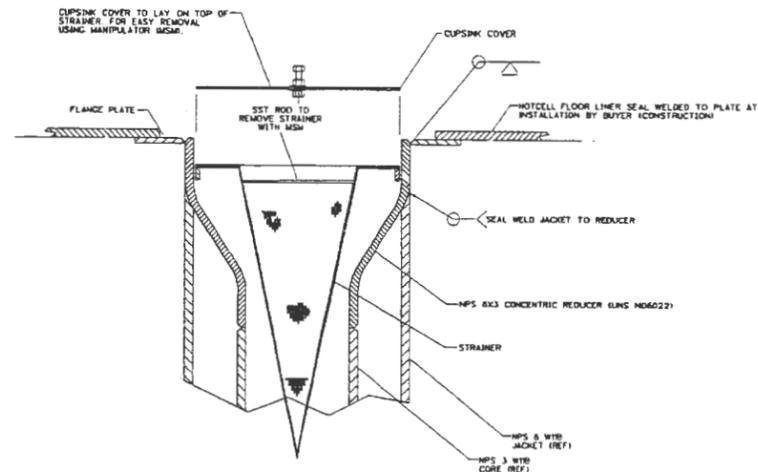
Typical Hot Cell Floor Drain Detail and Transfer Port Drain Detail for LAB Building
